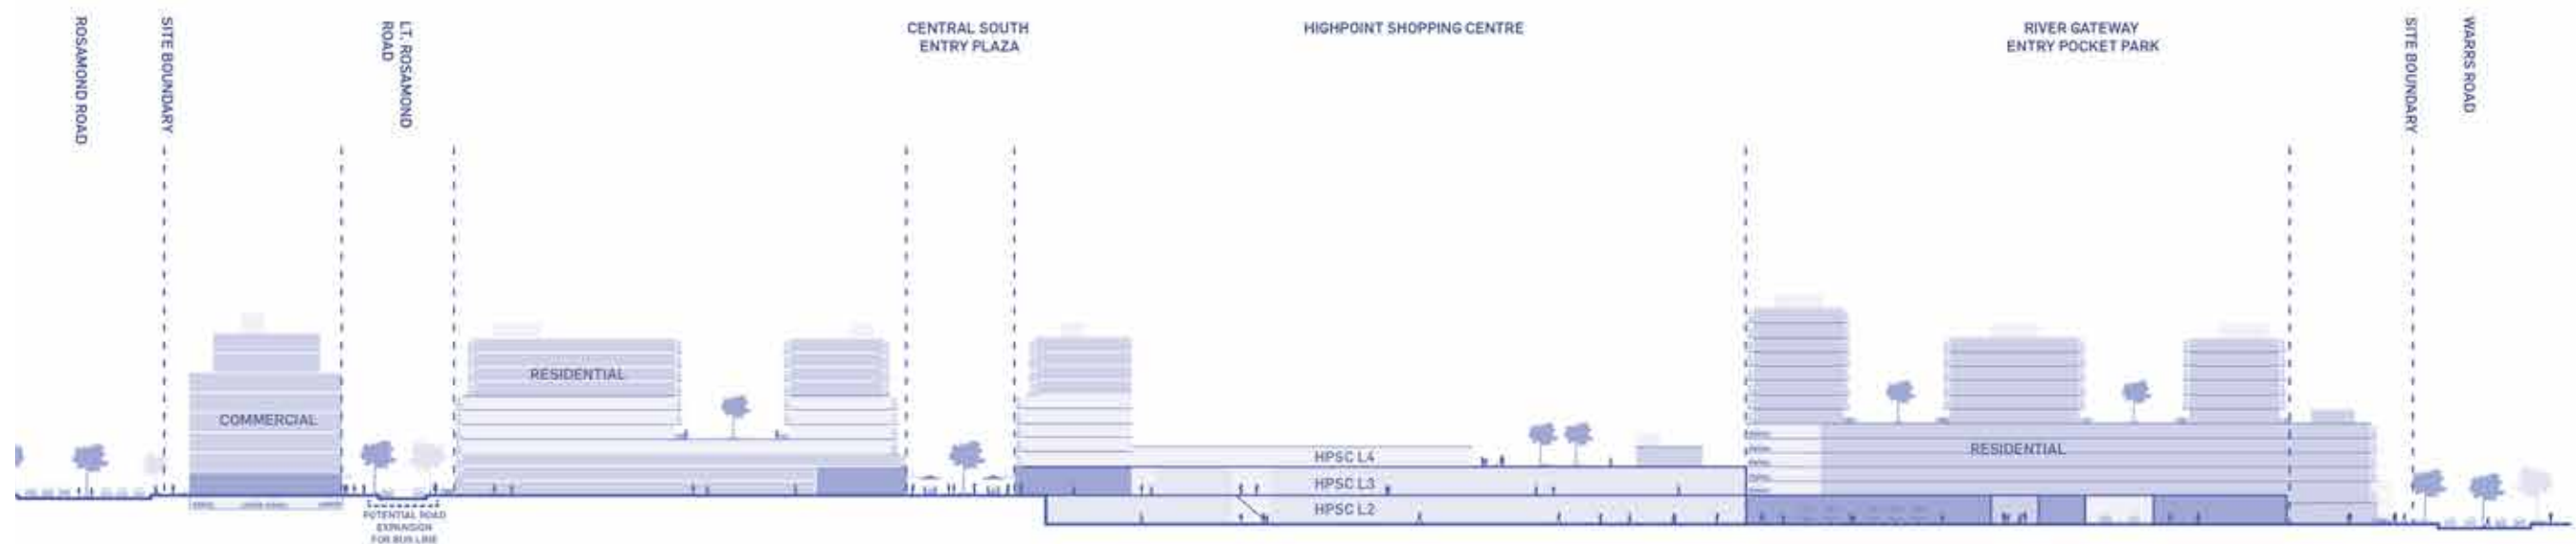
Site Section B - illustrates E-W connections through Rivergateway (walking distance 580m)
